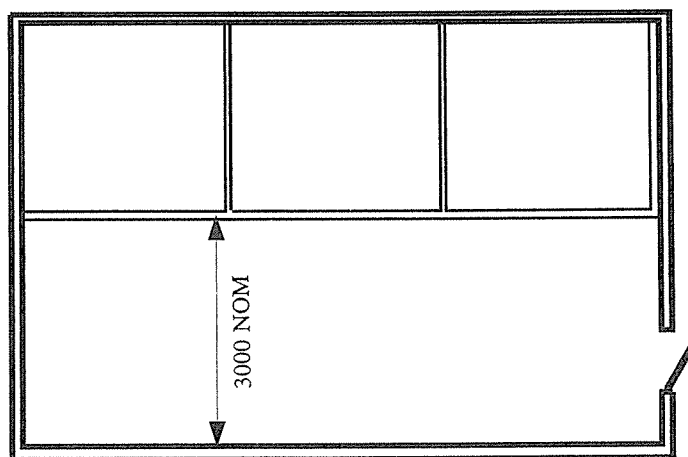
Typical Otis Well and Machine Room Plan, Multiple Shafts in Line
